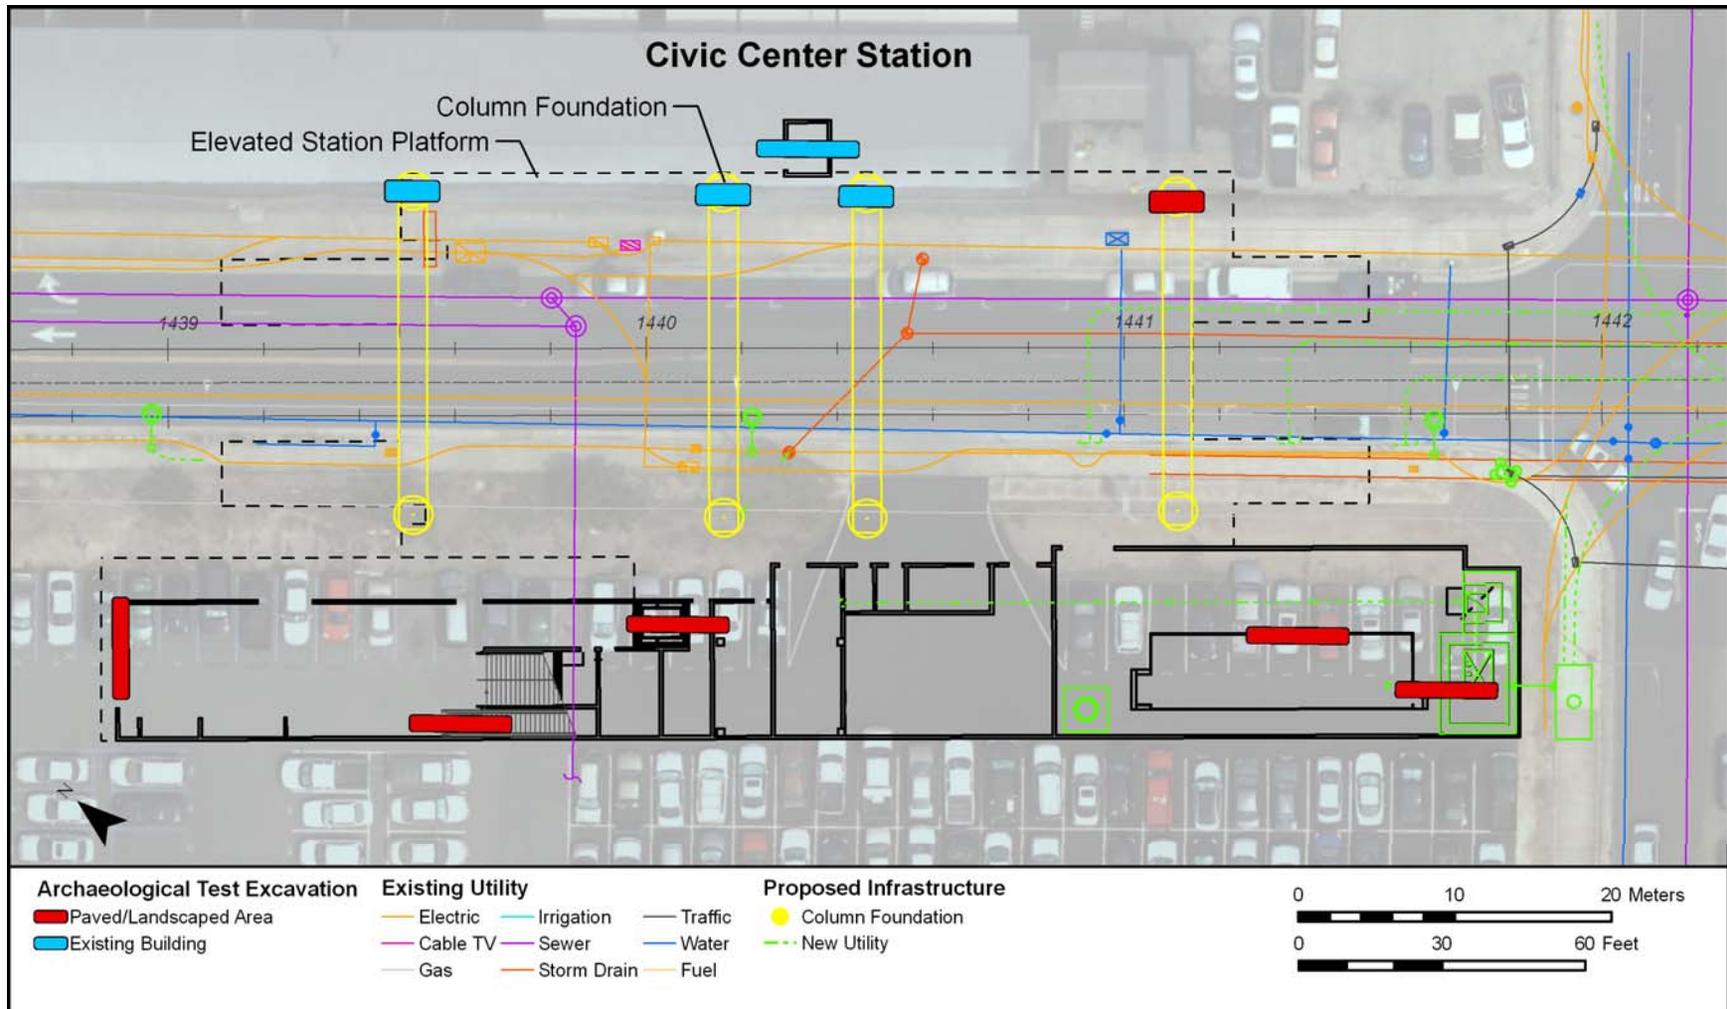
Civic Center Station, detail of column foundation layout showing proposed locations for archaeological inventory survey testing (due to constraints, test four out of eight station column foundations with 3' by 10' excavations); one test trench with 2' by 20' excavation at *mauka* elevator
